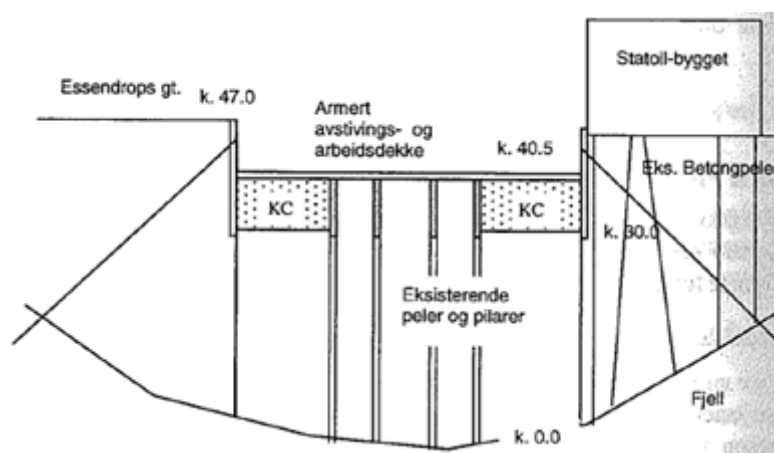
Schematic drawing of the excavation (Bergersen, N., Bye, A. 2000)
